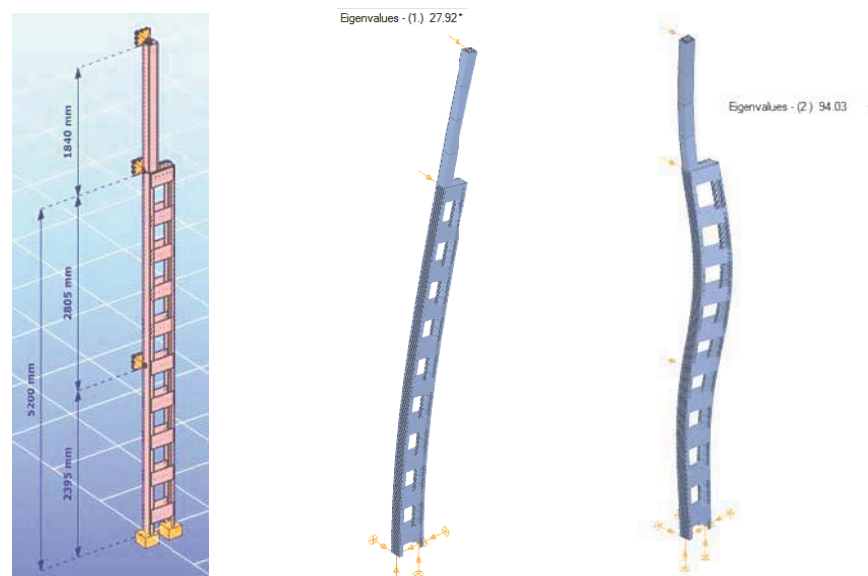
Model with boundary restrictions and the first (in-plane) and second (out-plane) buckling modes
